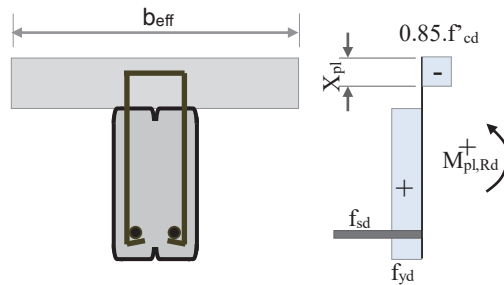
The cross-sectional section of the proposed composite beam
